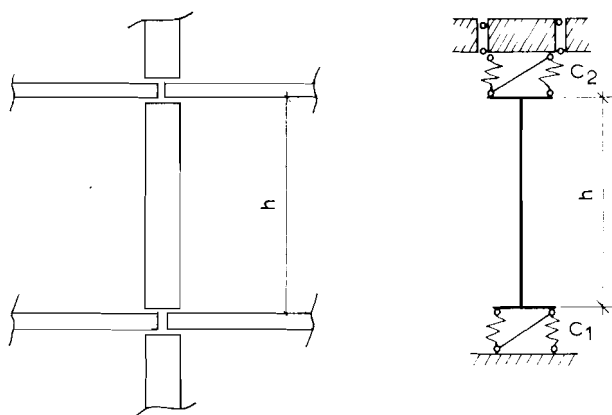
Joint of a platform type of inner wall panels and design diagram of a panel at deformations out of plane.
